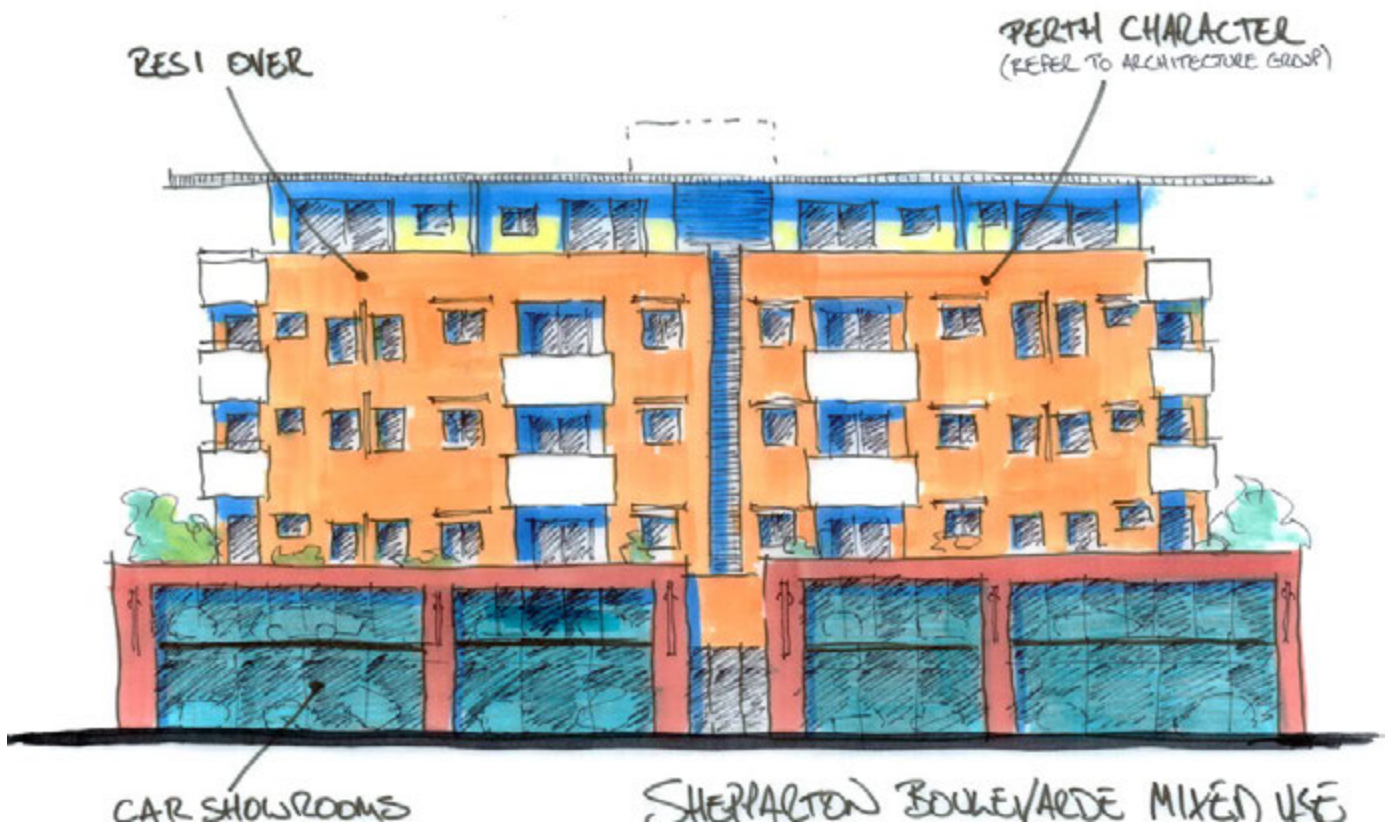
Mixed use building proposal with Shepparton Road with boulevard treatment
